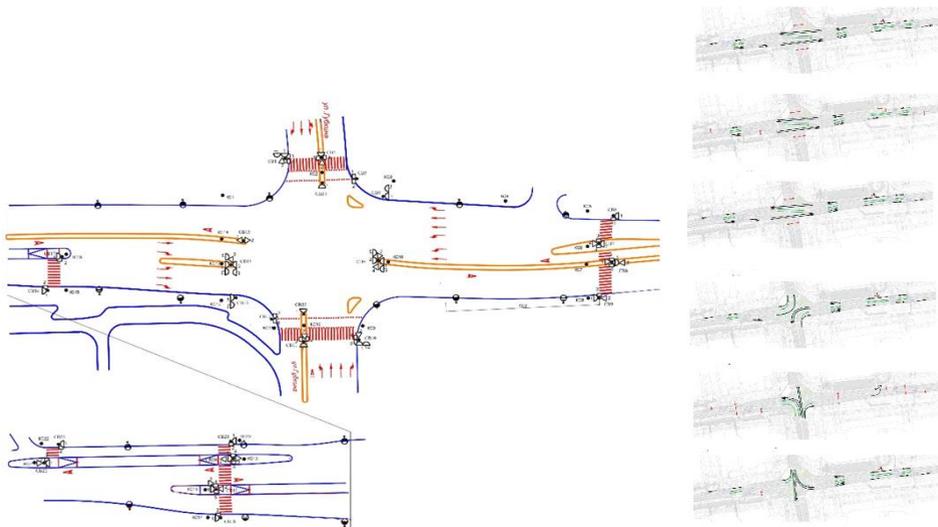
Traffic light layout plan at the intersection of Shchors st. - Gubkin st.
